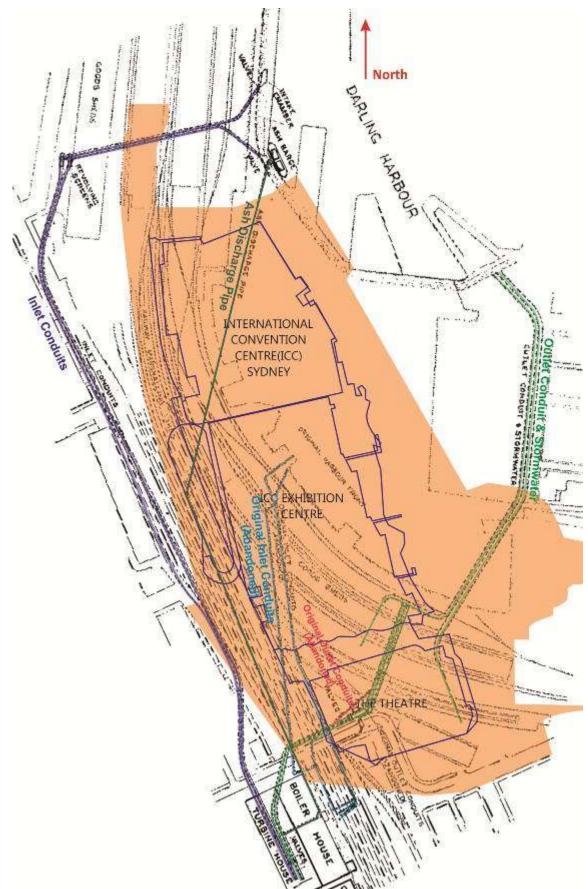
Overlay of proposed buildngs onto the staged Powerhouse inlet and outlets plan. This indicates there are outlets beneath the proposed footprint of the Exhibition Centre and Theatre, and to the north of the Convention Centre. Myers 1933
